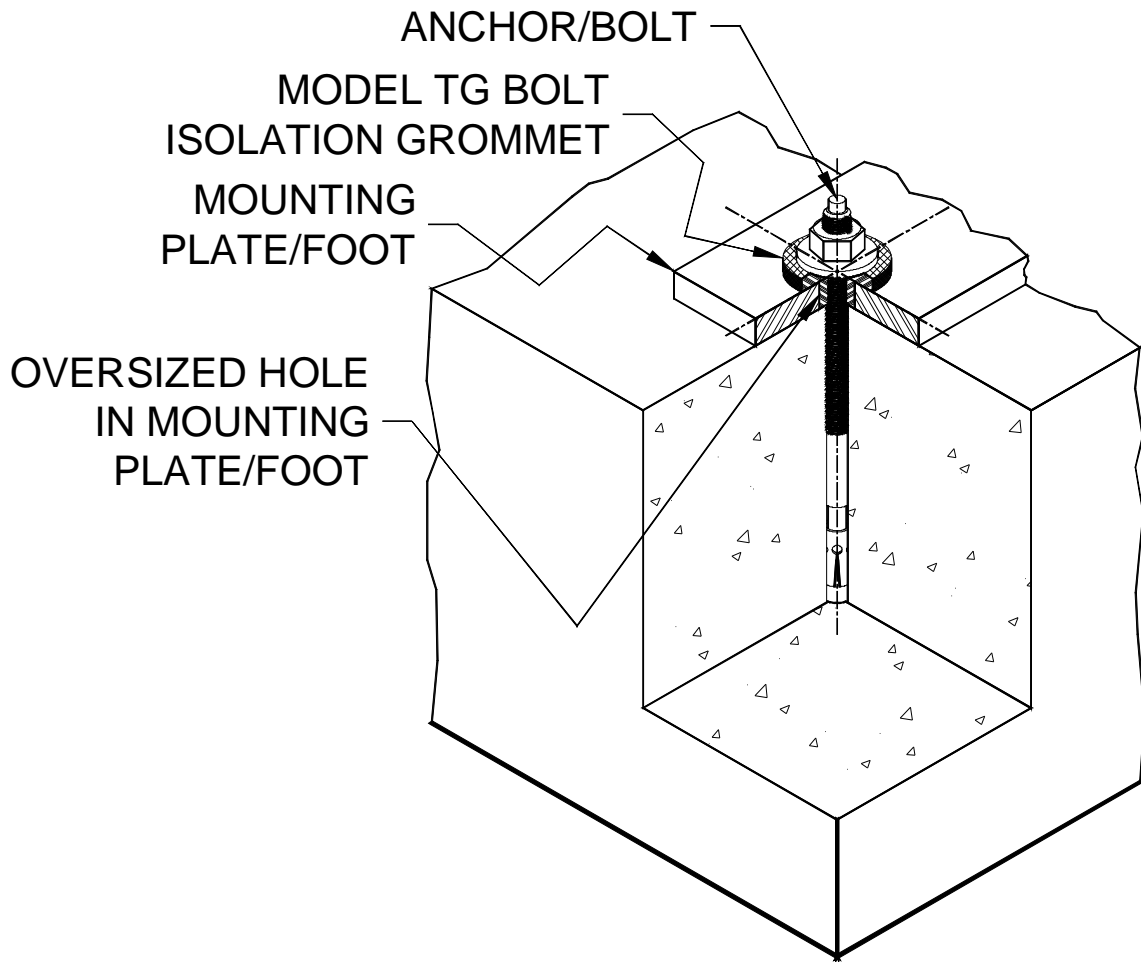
Typical TG Bolt Isolation Grommet Installation.
